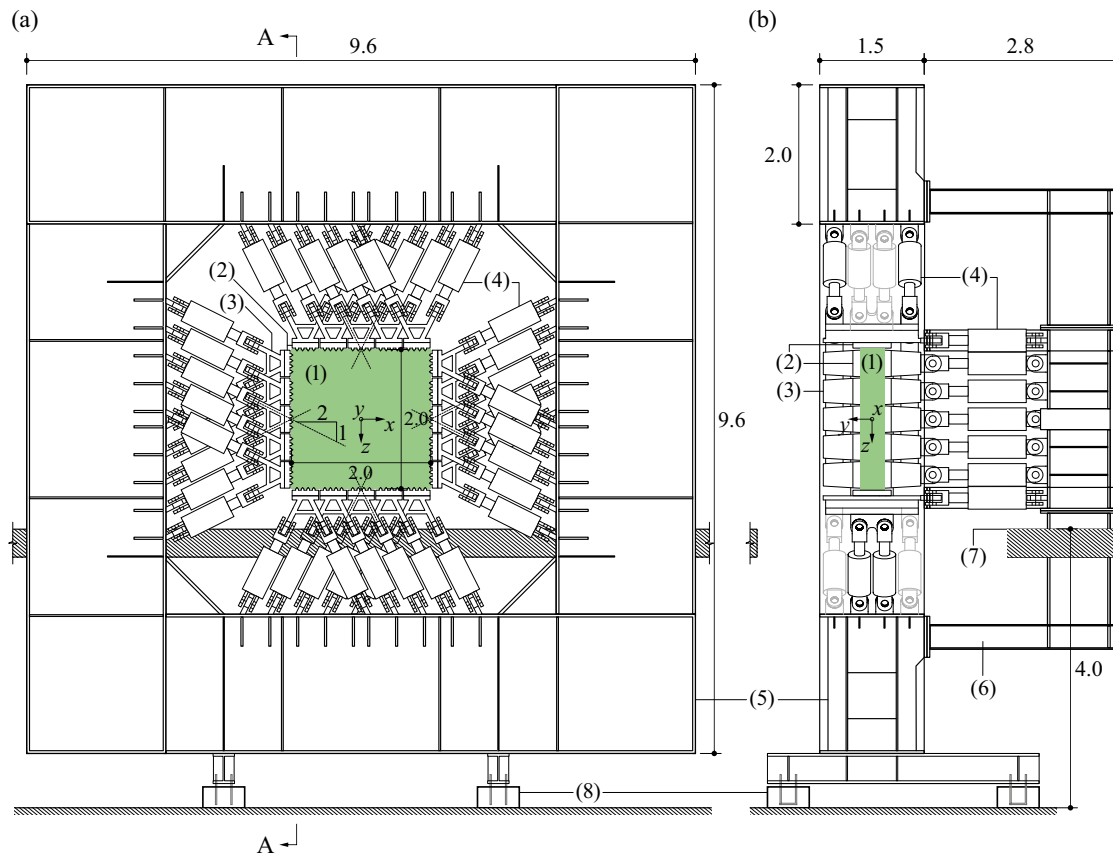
Overview of the LUSSET: (a) elevation; (b) section A-A (dimensions in m); adopted from [1].
